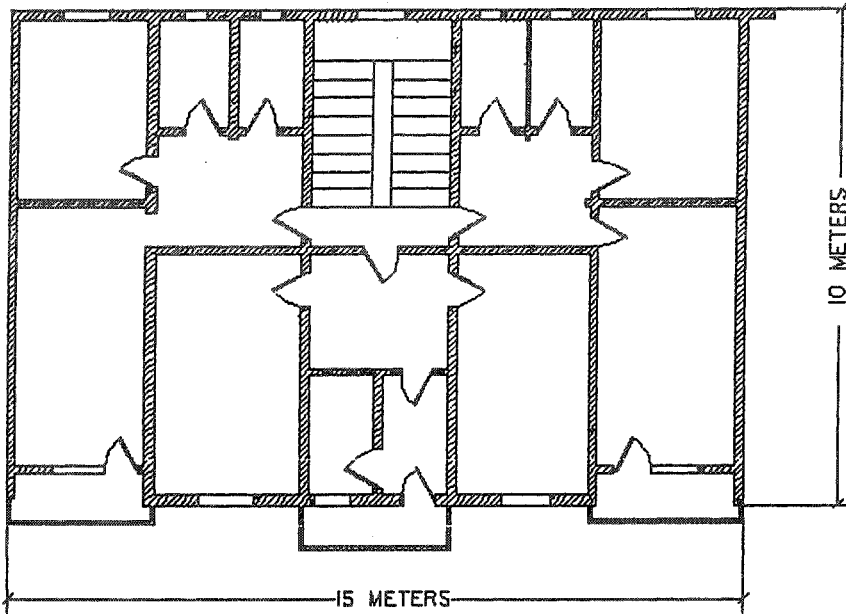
TYPICAL HENAN APARTMENT BUILDING FLOORPLAN
